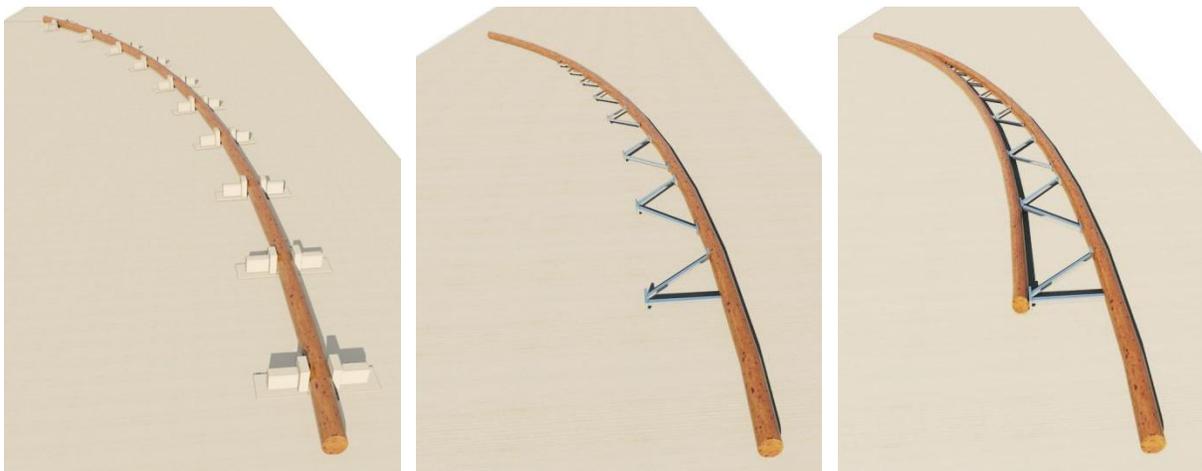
Construction of spruce sapling truss – bend into form and attach metal spacers
